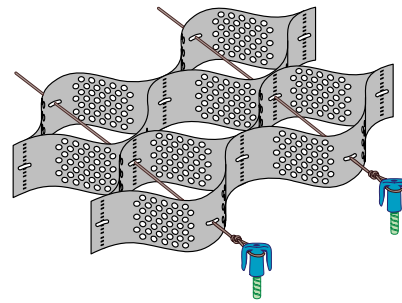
ATRA Anchor for Crest and Toe Anchorage
